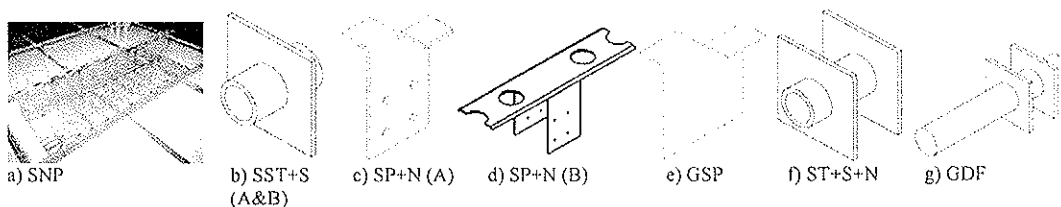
Shear connectors inserted in prefabricated concrete slabs
